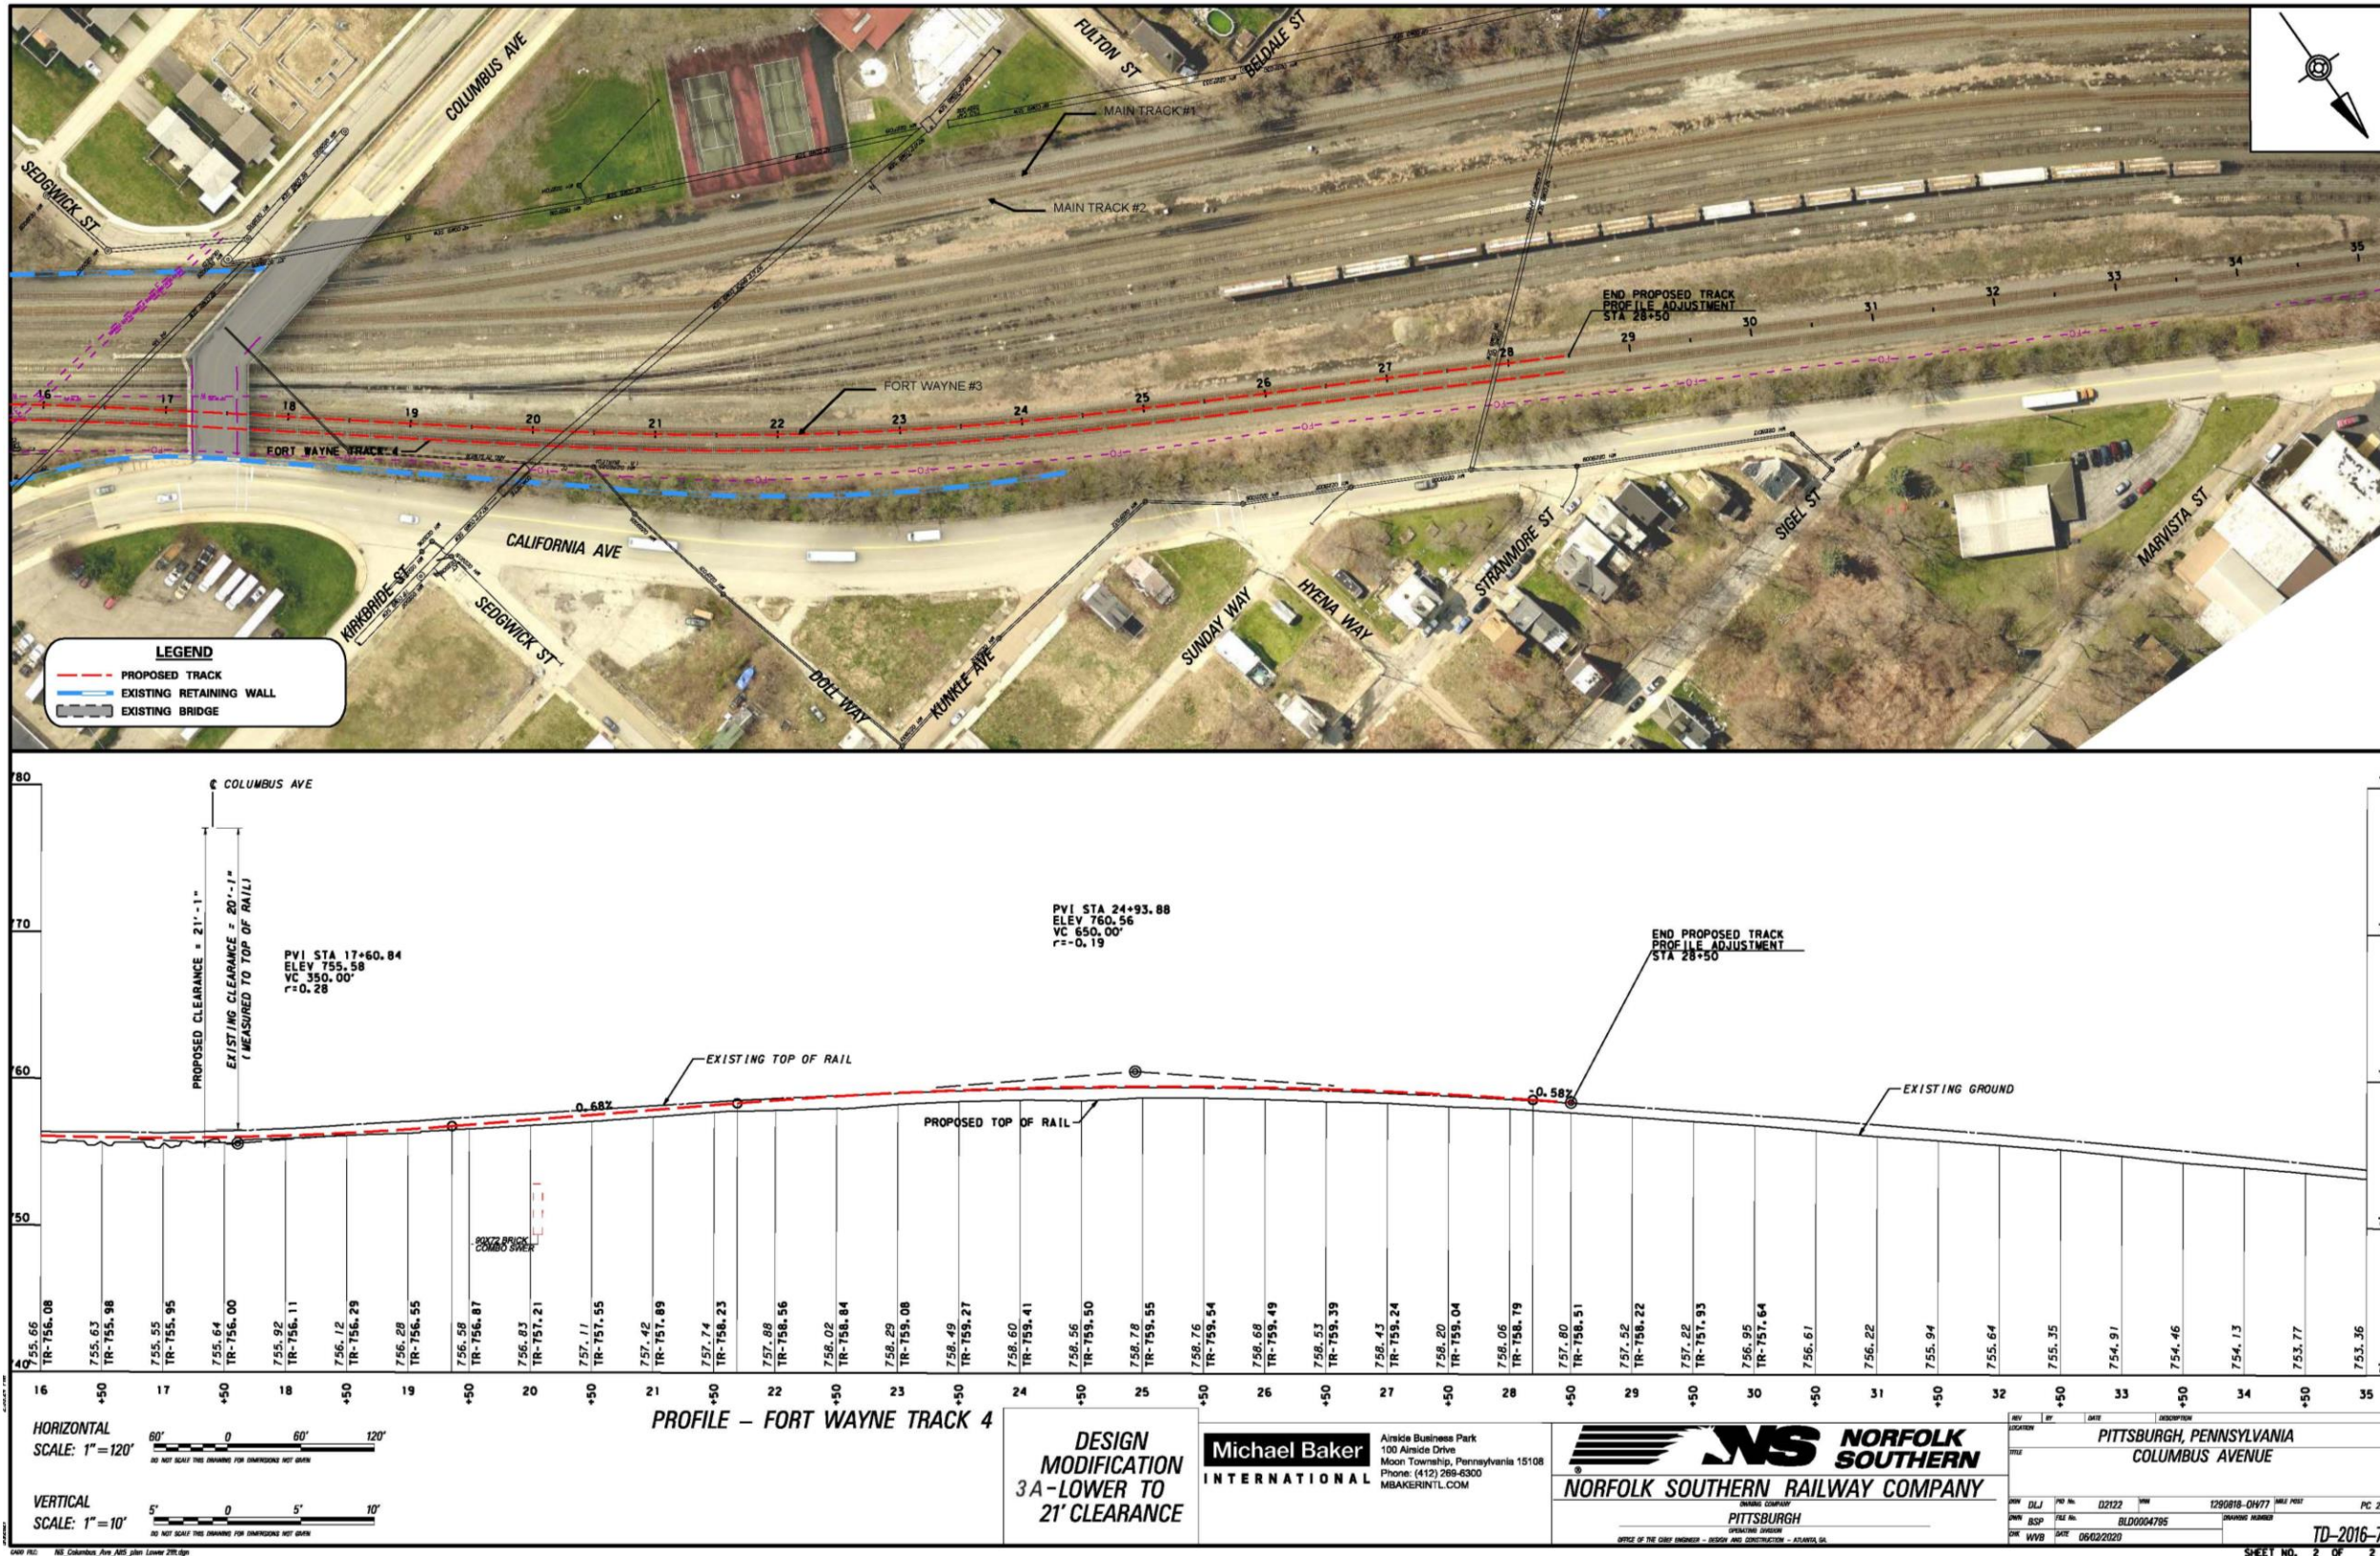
Plan and profile views of Alternative 3A showing area south of the bridge.
